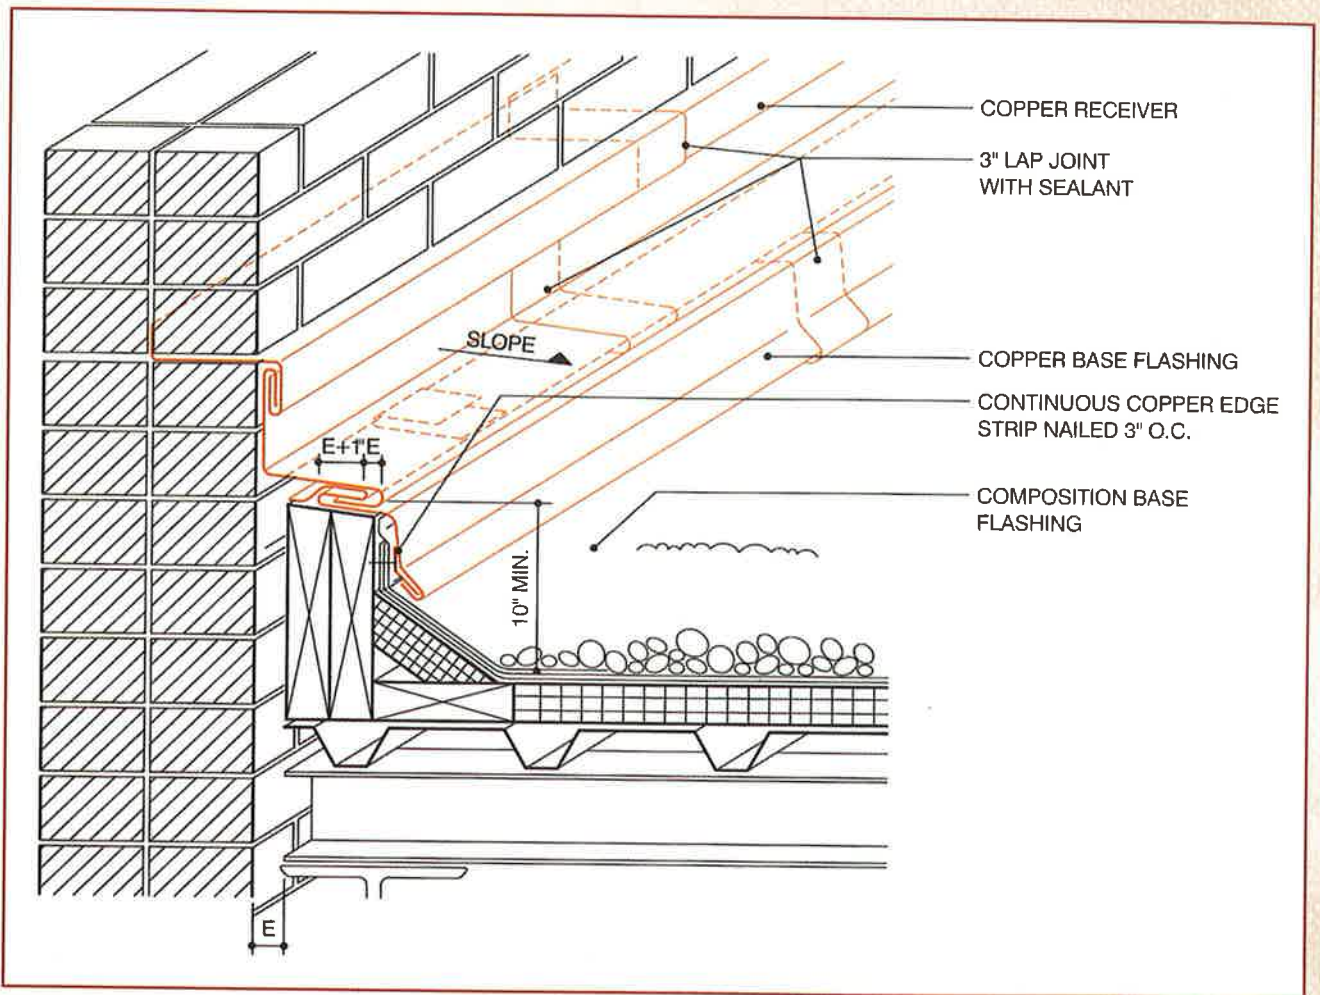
Figure F. Expansion Joint at Roof and Wall. 4.5.5/A
